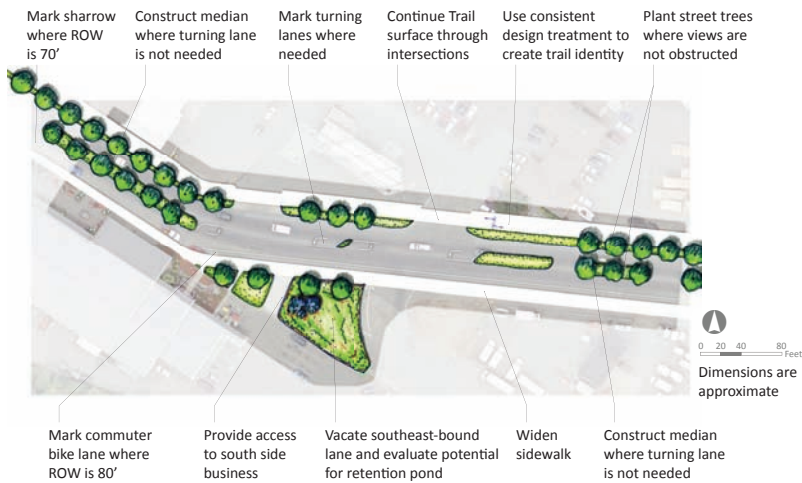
Proposed Marine Drive and West 2nd Street improvements.
